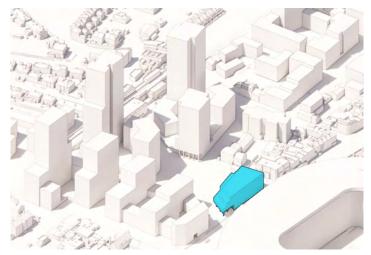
Proposed illustrative massing highlighting Plot E, one of the feature design approach buildings
